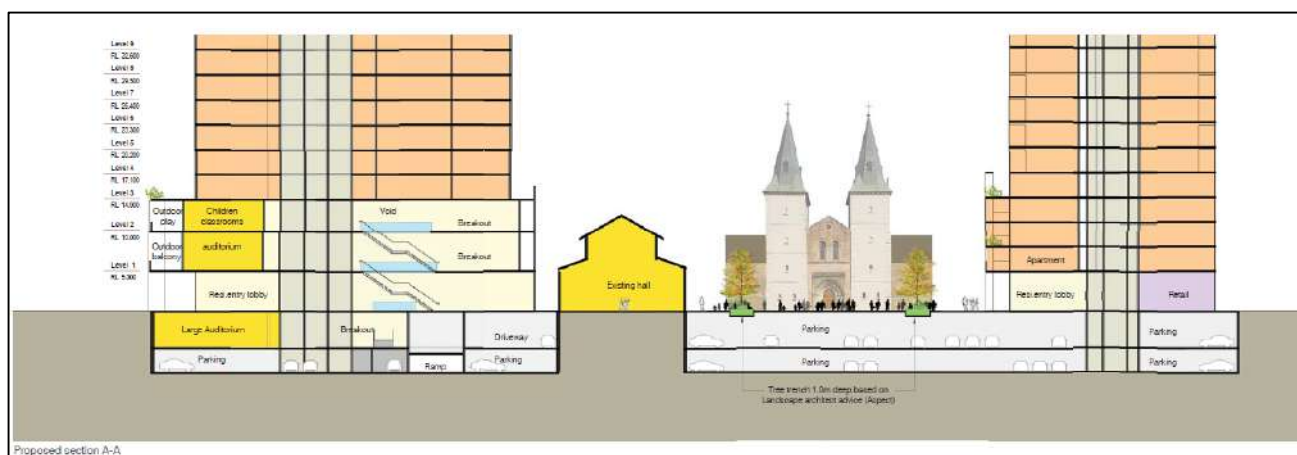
OPTION 1: HALL RETAINED—PROPOSED SECTION, VIEW EAST (SOURCE: ARCHITECTUS 2018)
